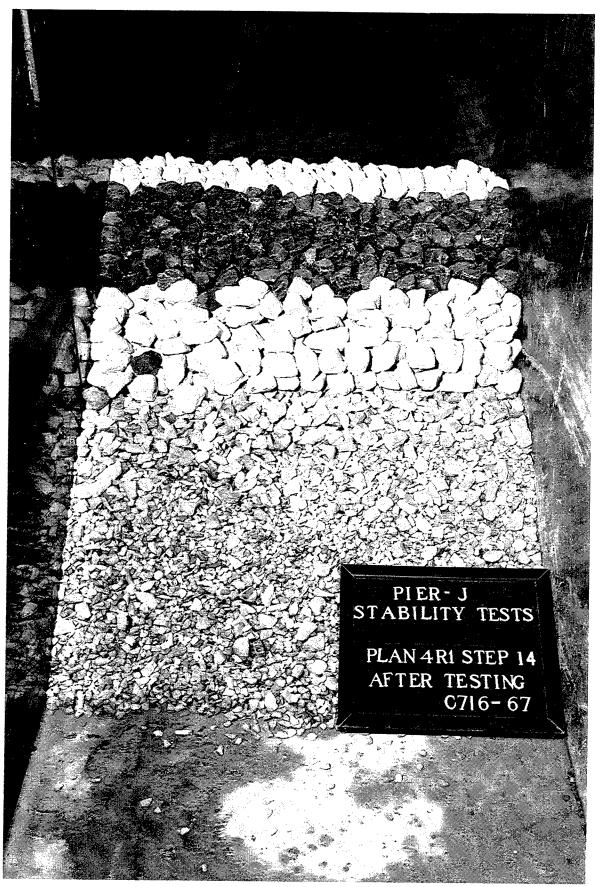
Harbor-side view of Plan 4R1 after testing step 14 of Hydrograph 3A
